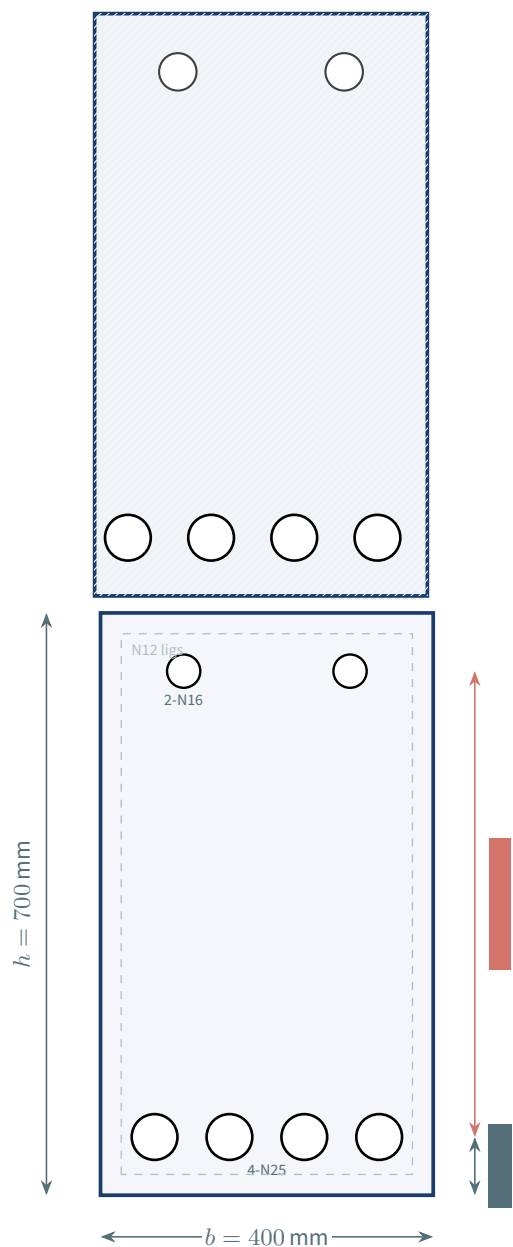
Reinforced concrete beam cross-section — Span 2 edge beam.
